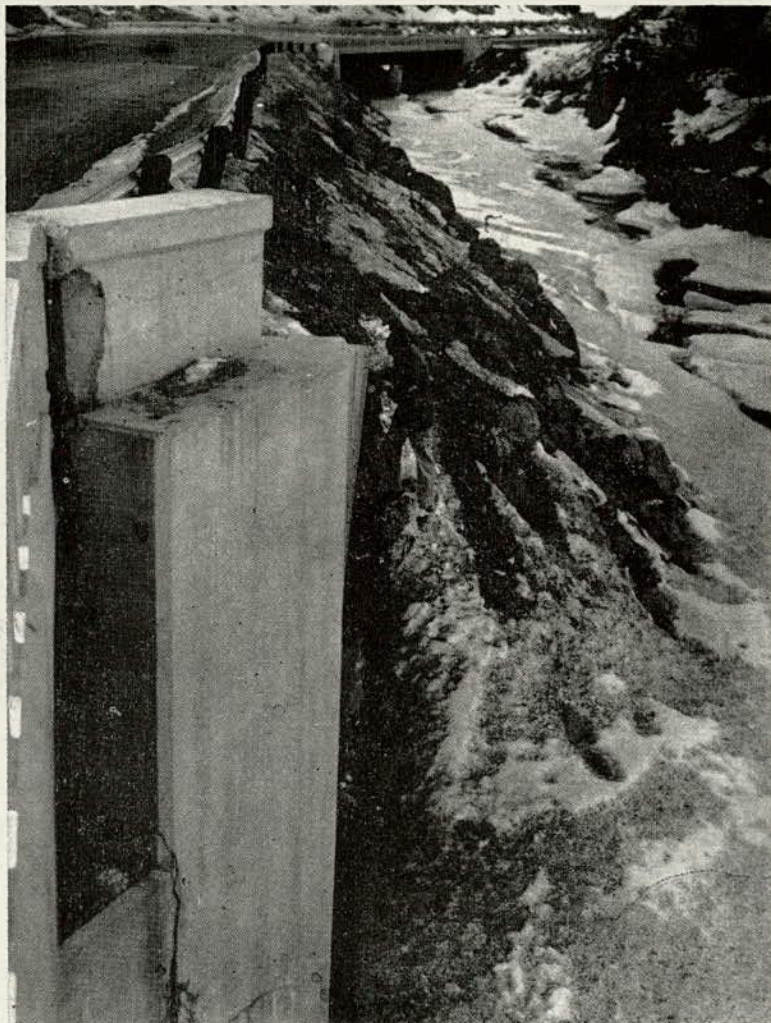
Distress in bridge abutment indicates incipient slide. Right-hand wing wall of bridge shown in lower center of Figure 34. In addition to offset of the wing wall shown here, rockers beneath bridge girders were tipped. (Photograph by D. J. Varnes, U. S. Geological Survey)
